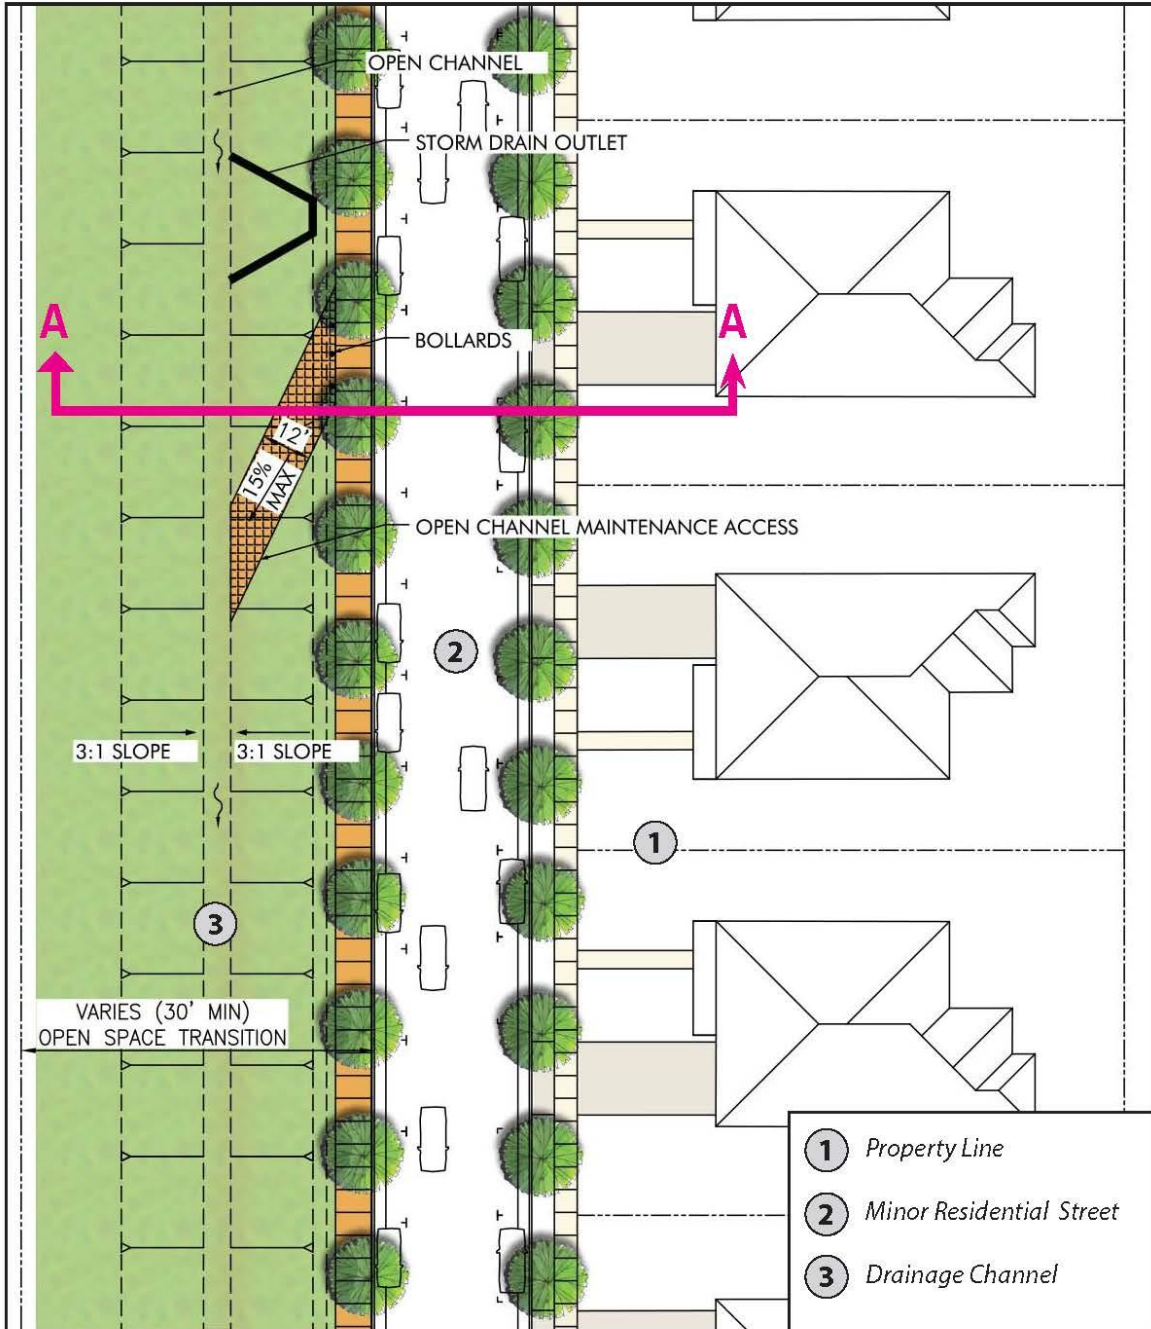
Typical Open Space Transition along Open Space Drainage Channel – Homes Fronting Condition
